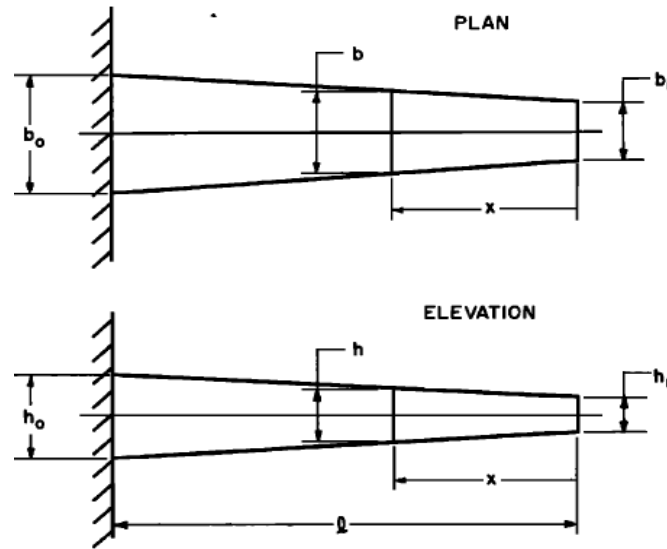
Plan and elevation view of cantilever tapered beam with linearly varying width and depth.
